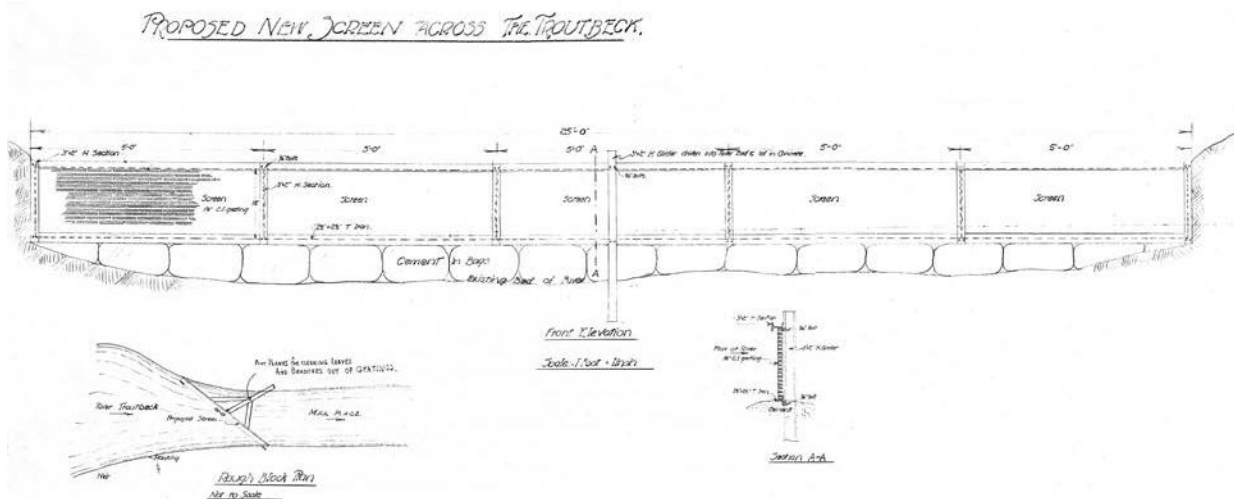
Plan of 1924 showing proposed grating over the mill race at Troutbeck Bridge (CAC(B) BDHJ/16/3 1922-1937)
